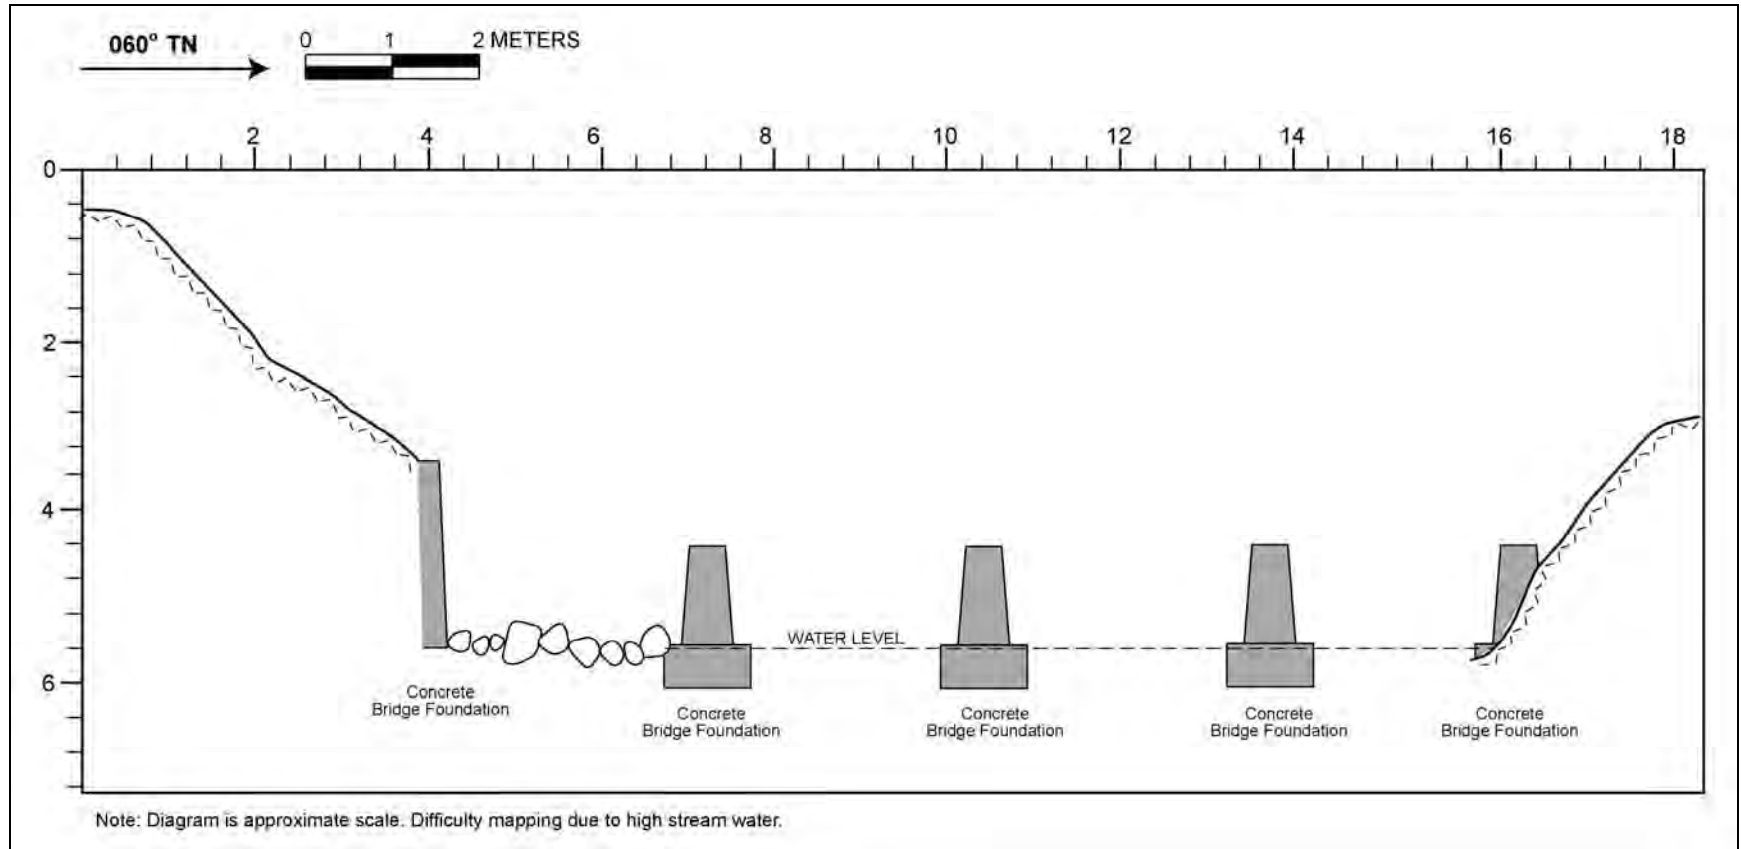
Cross-section diagram of SIHP # 50-80-09-9530 G railroad bridge
